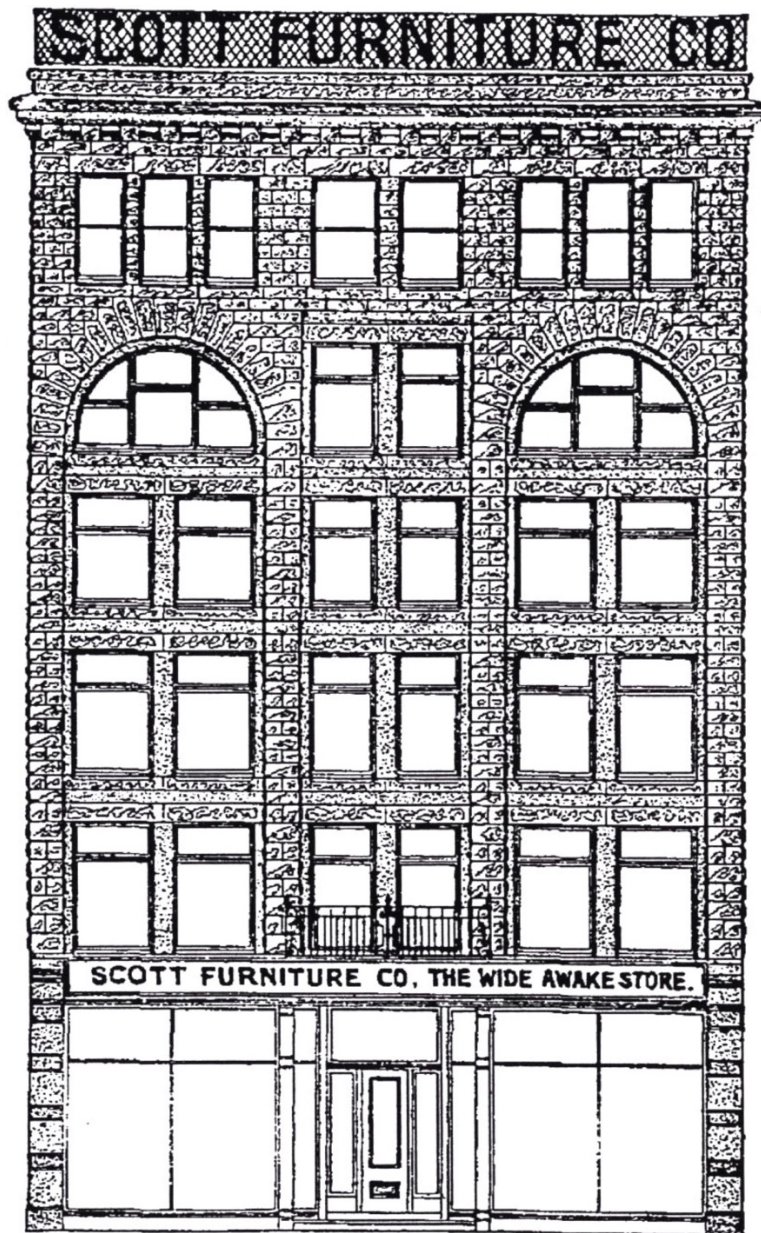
Architect's rendering of the front (east) façade of the Scott Block, 1904.
